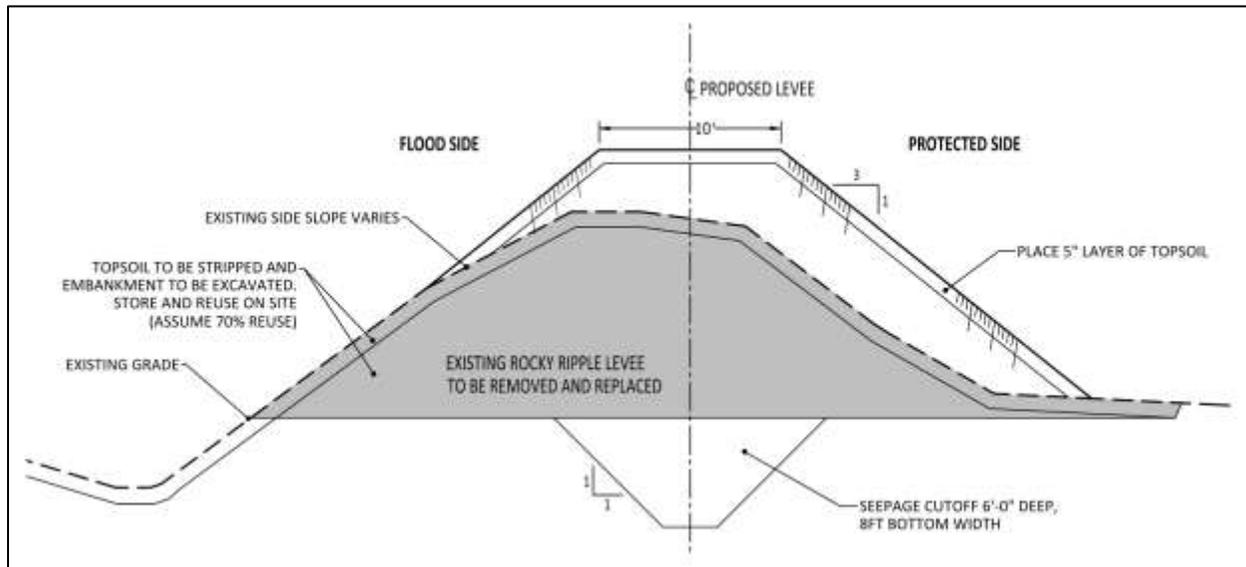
Typical Levee Section (Assuming Removal of Existing Levee)
